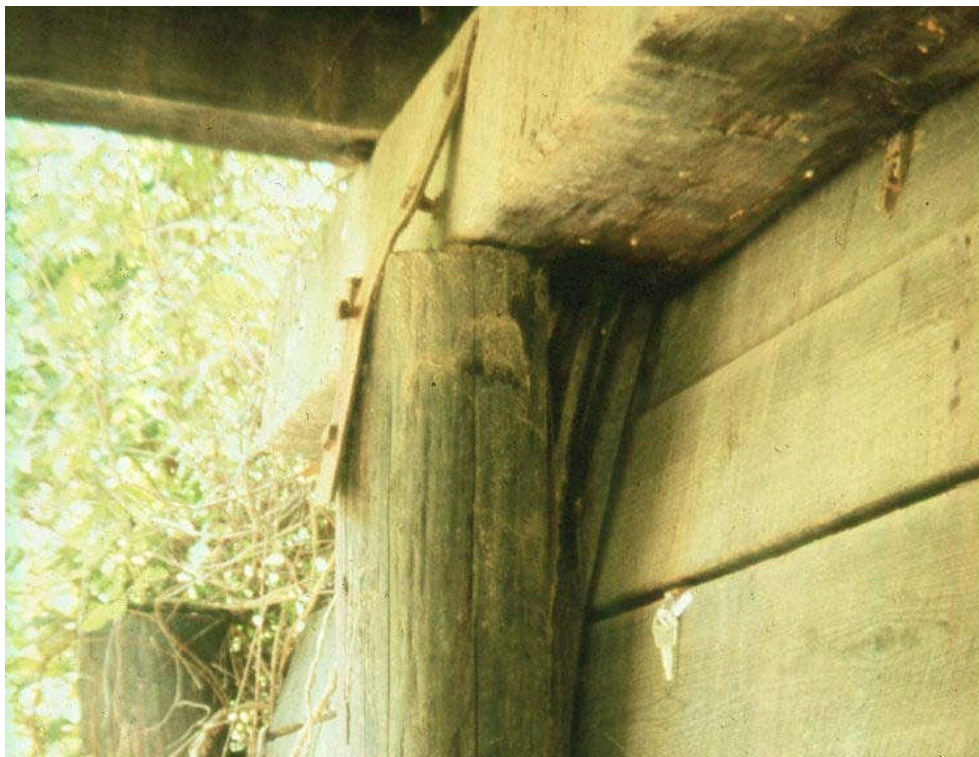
Local Failure in Timber Pile due to Lateral Movement of Abutment
